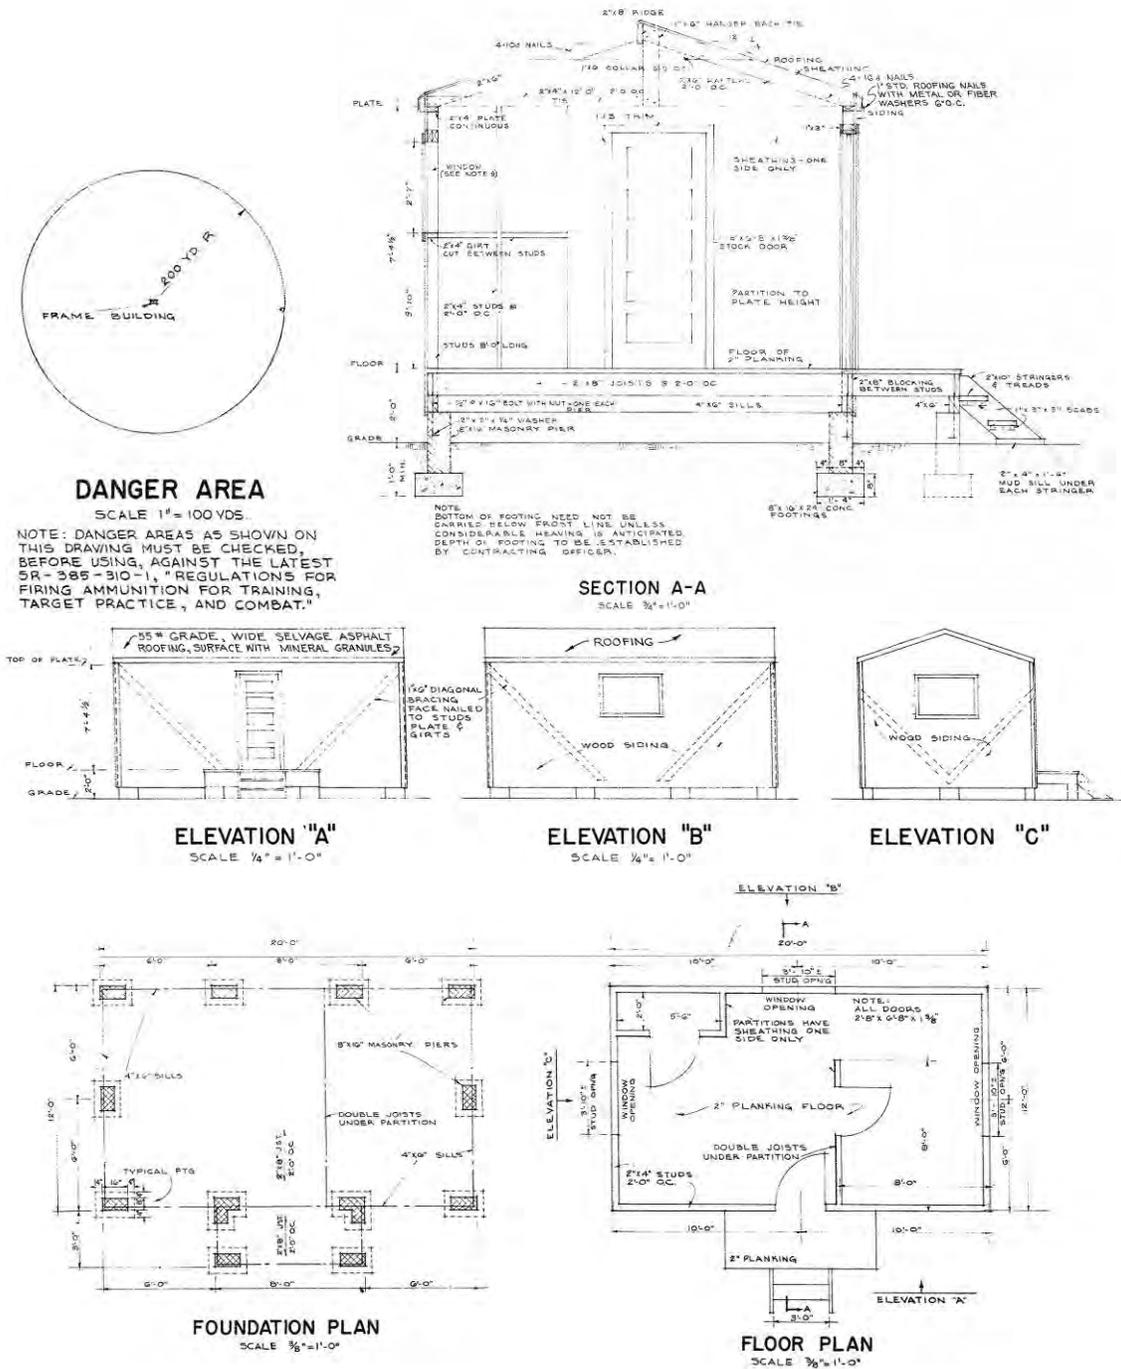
Mines and booby trap area, danger area and building section, elevations, and plans, Fort Bragg, NC, 1952 (standard drawing 28-13-36 sheet 1 of 1; mines and booby trap area, plans, elevations, and details; 11 November 1952).
